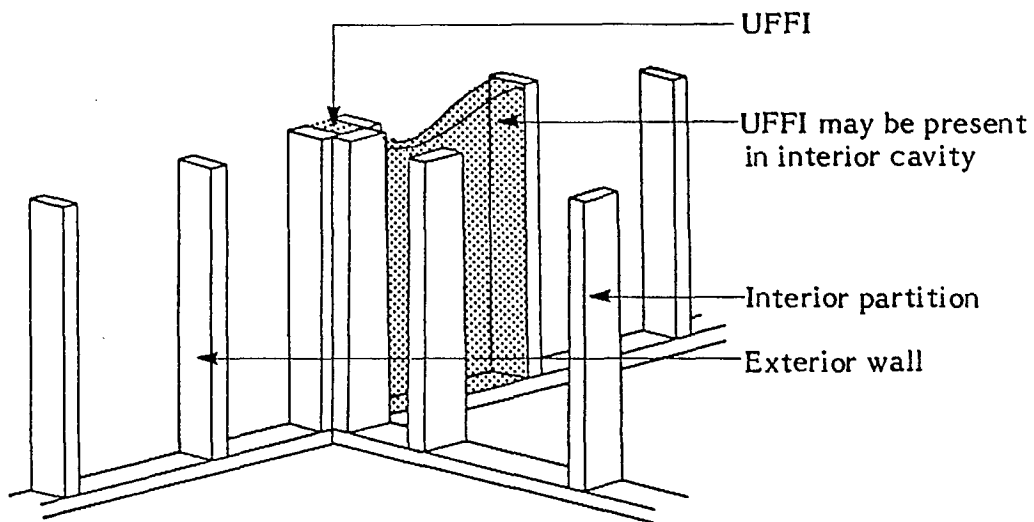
EXTERIOR WALL ENCLOSED BY THE OUTSIDE STUD OF AN INTERIOR PARTITION WALL
